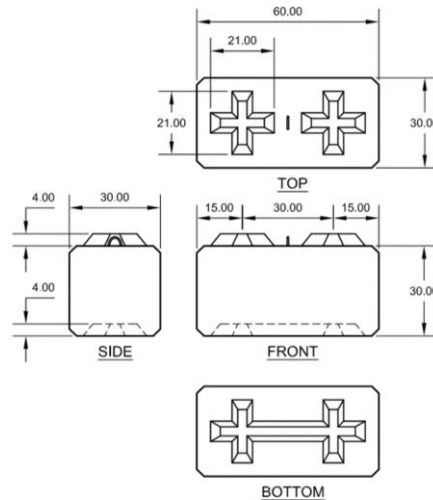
Retaining Wall Concrete Blocks (dimensions in inches)
